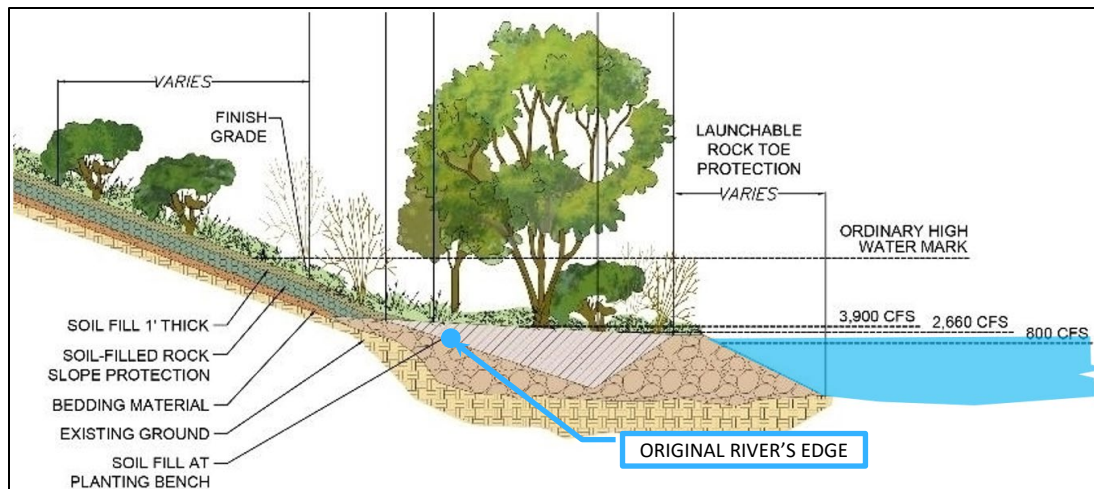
Contract 1 Site 2-1 planting bench conceptual cross section
